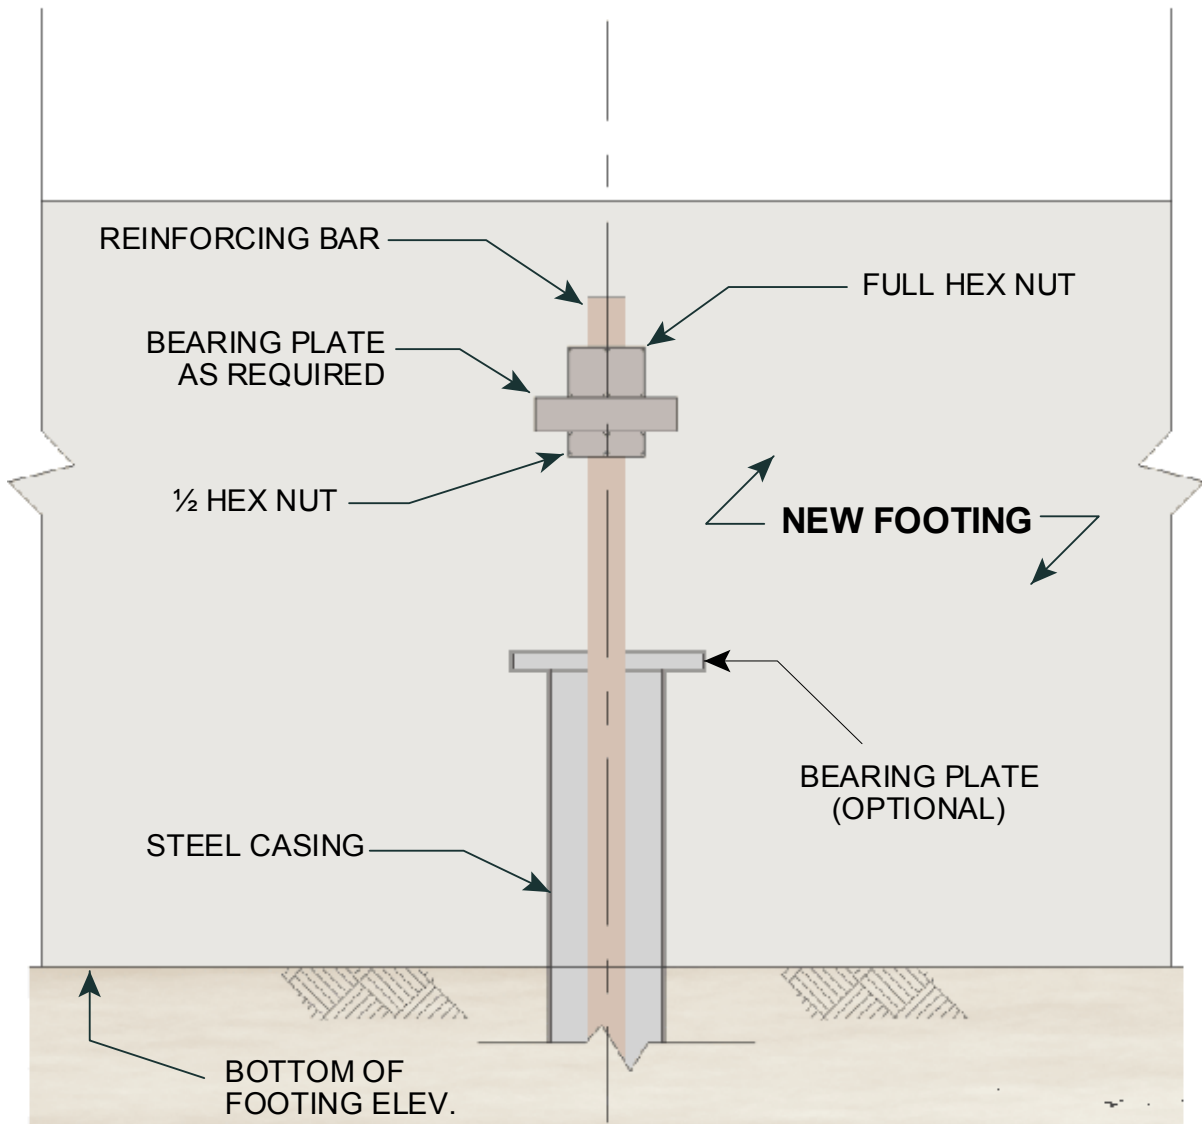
Pile to Footing Connection (compression and tension loads).
